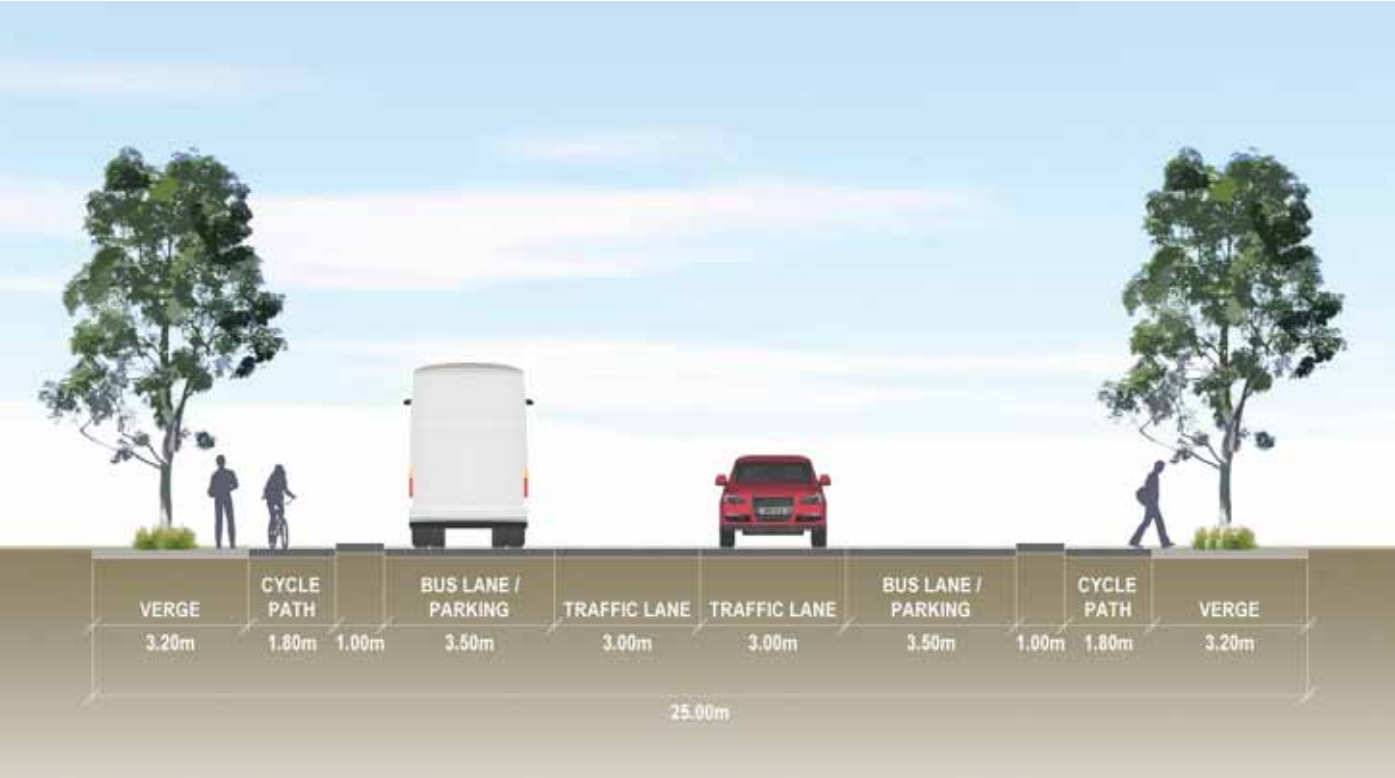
Oswald Street Conceptual Cross Section (East of Stephenson Avenue)
